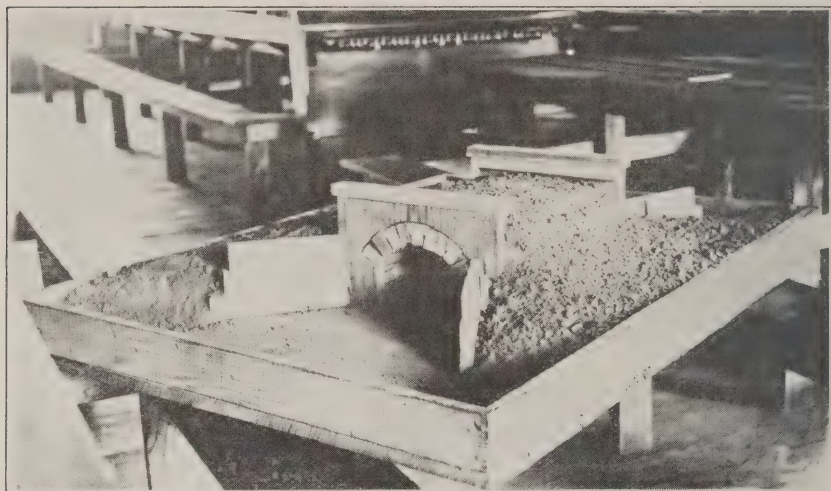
Arch culvert built of wooden blocks in a sand box.
